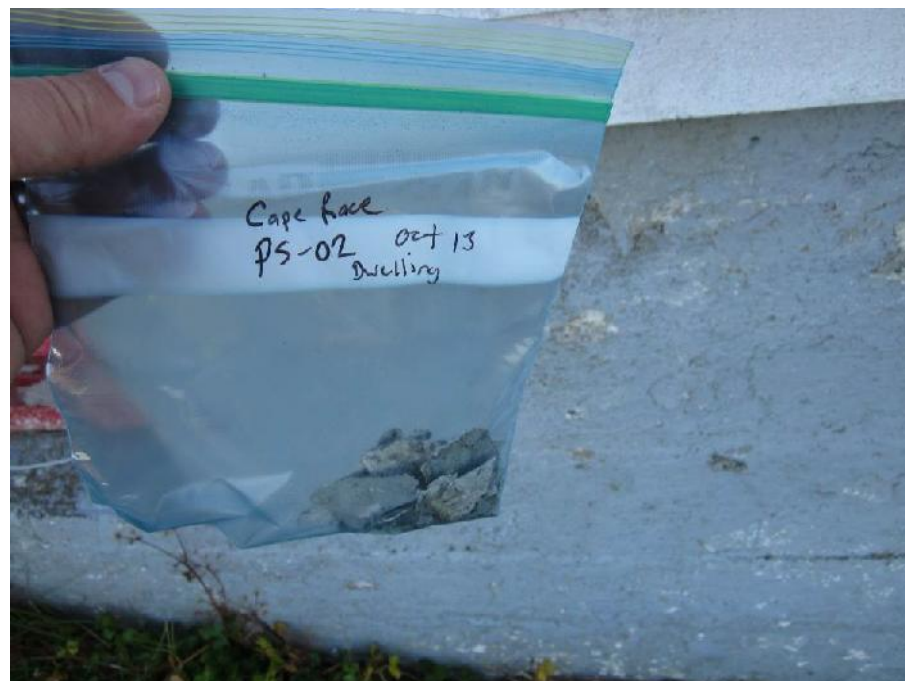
View of location of paint sample PS-02 on exterior foundation wall.
